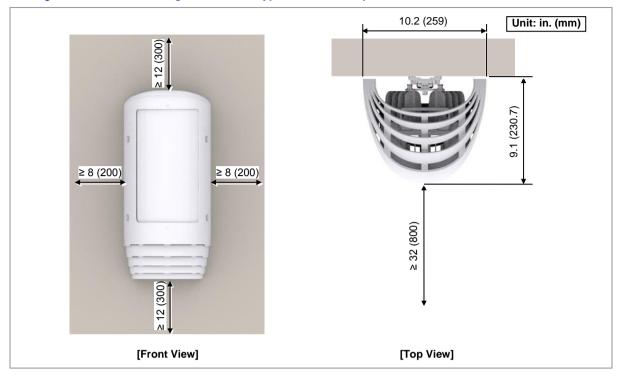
Pico HRU Arrangement_ Wall Type with 180° wrap around cover Installation
